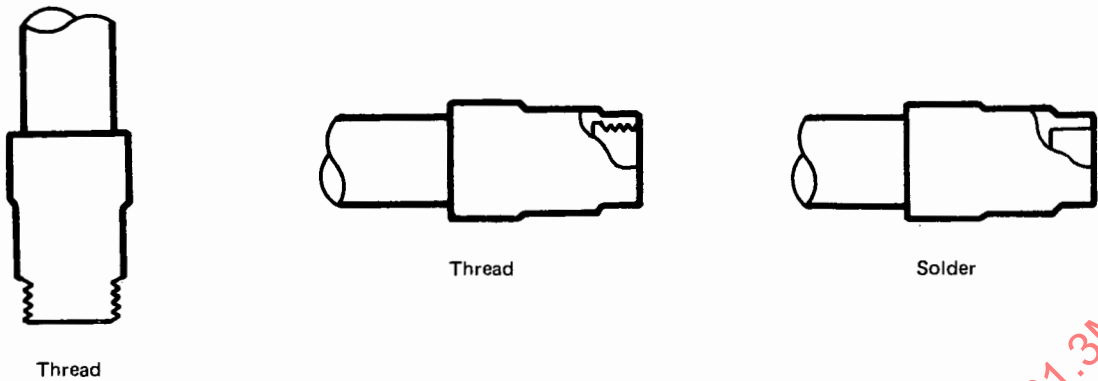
B STRAIGHT INLET CONNECTION, INTEGRAL WITH VALVE HOUSING
